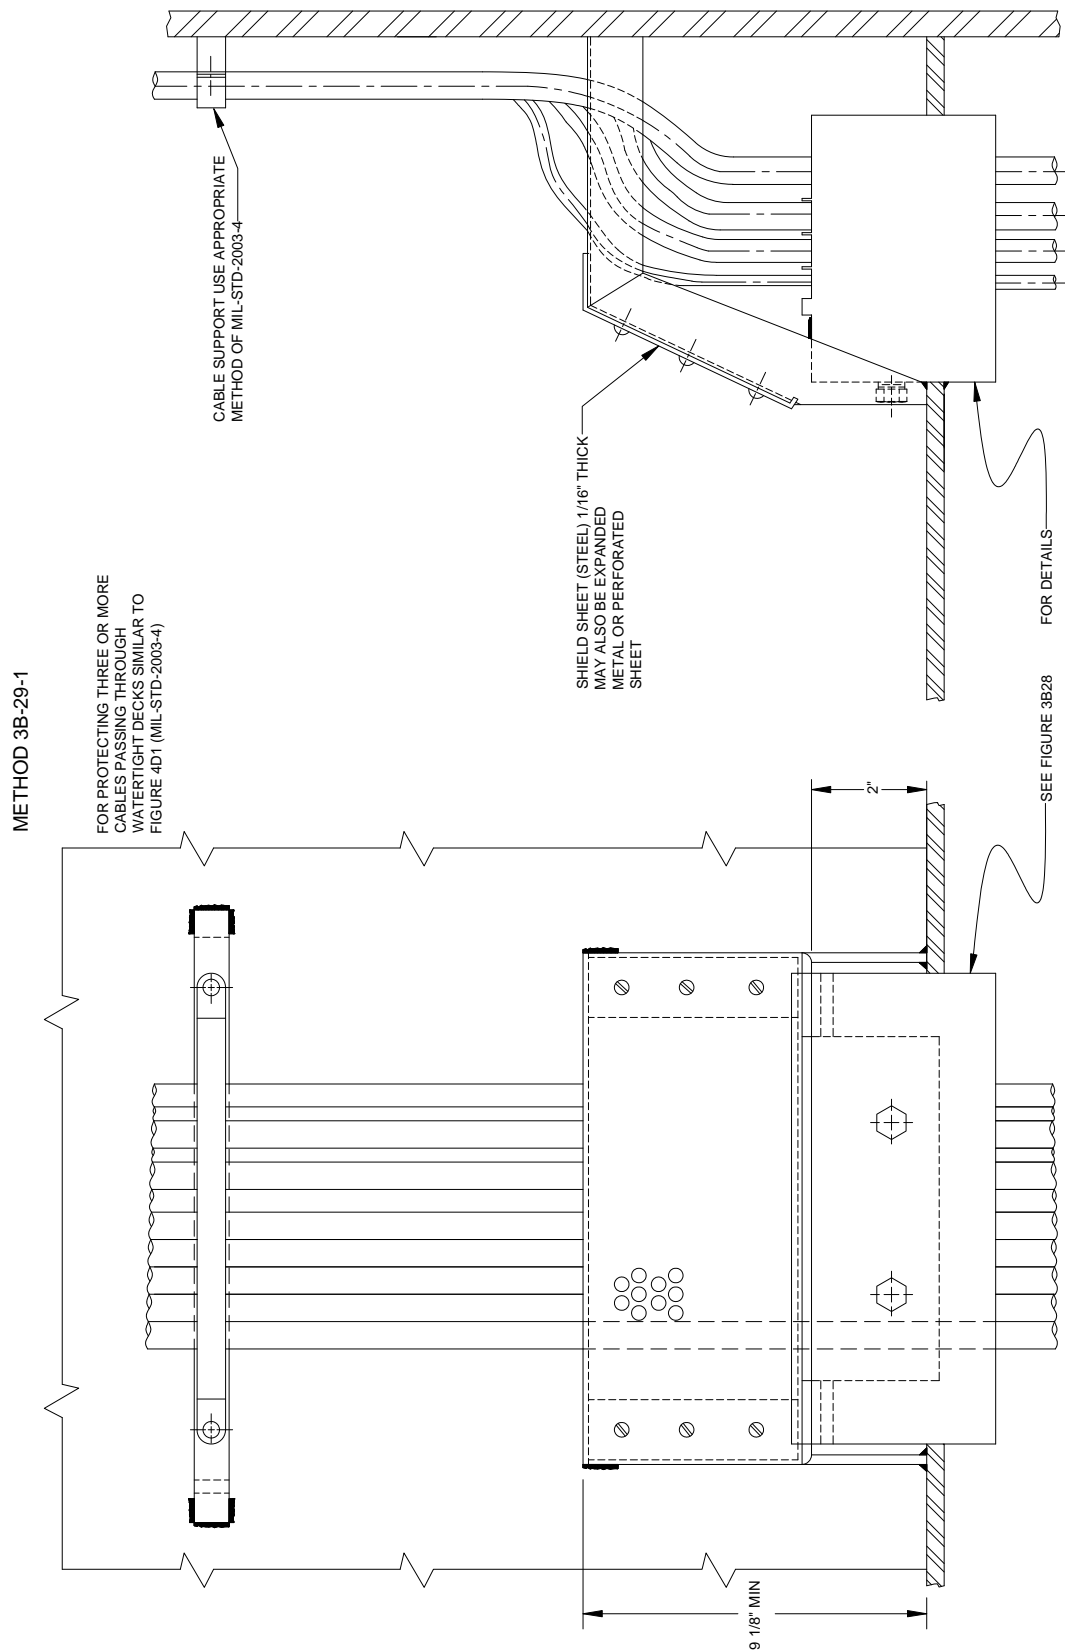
B29. Multiple cable penetrator (type RGS and RGA) shield.
